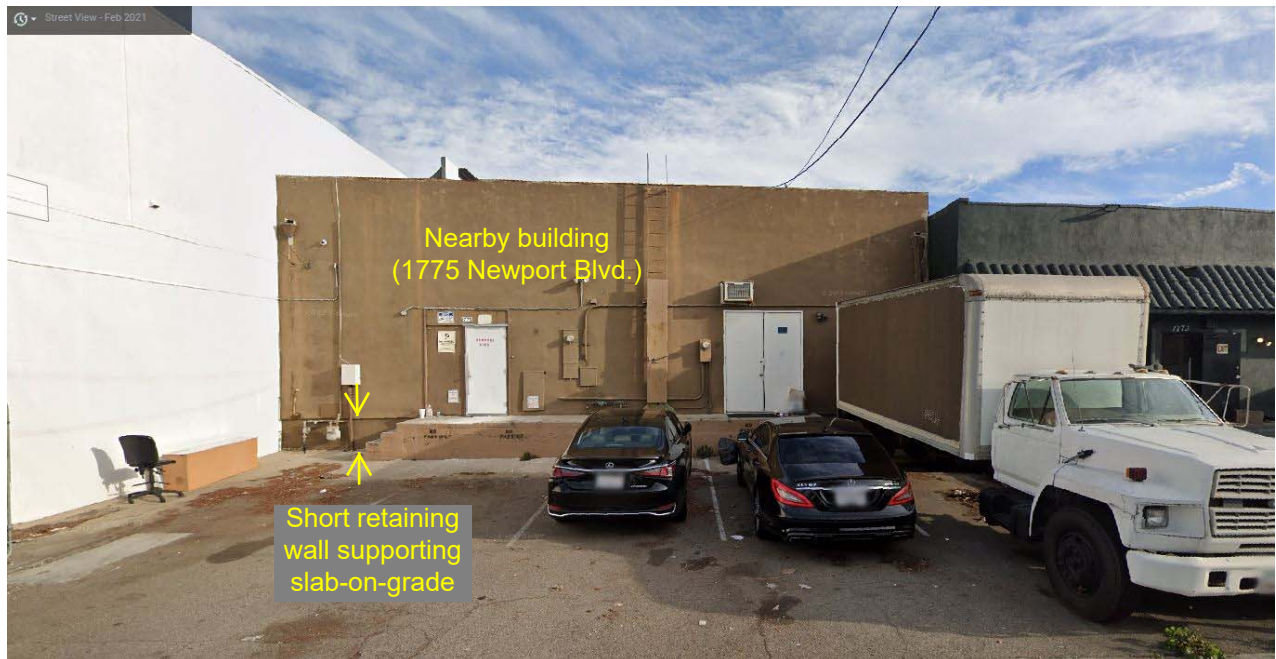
A researched photo showing the rear elevation of a nearby building - 1775 Newport Blvd. (see Photo 2). This photo shows an example of how 1781 Newport was likely originally constructed (before the raised floor addition was built), with a short foundation retaining wall, a slab-on-grade interior floor, and a raised dock for loading/unloading trucks.
